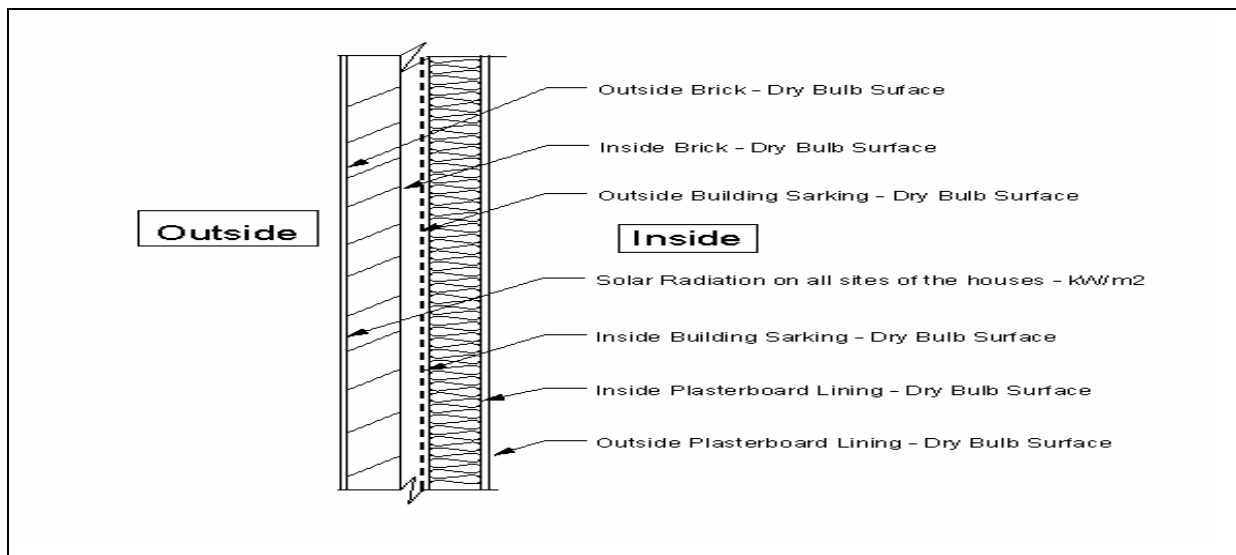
Horizontal profile of measurements through the north and south side of the brick veneer wall section of houses
